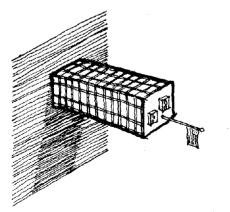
1.0g, or 100% of gravity, is equivalent to designing a building which cantilevers from a vertical surface.
